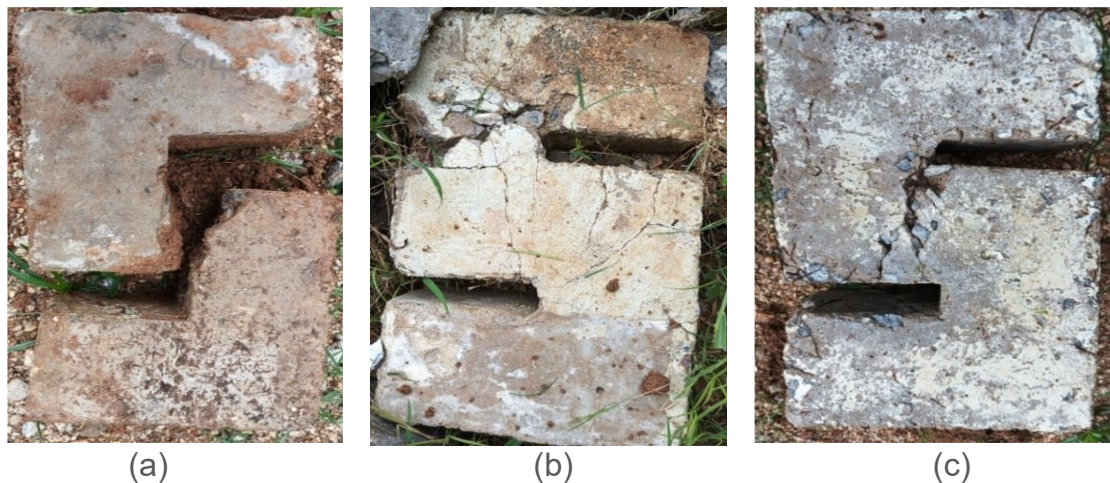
Failure patterns of the GPC specimens: (a) without shear reinforcement; (b) with shear reinforcement and fibres; (c) without shear reinforcement, with fibres
